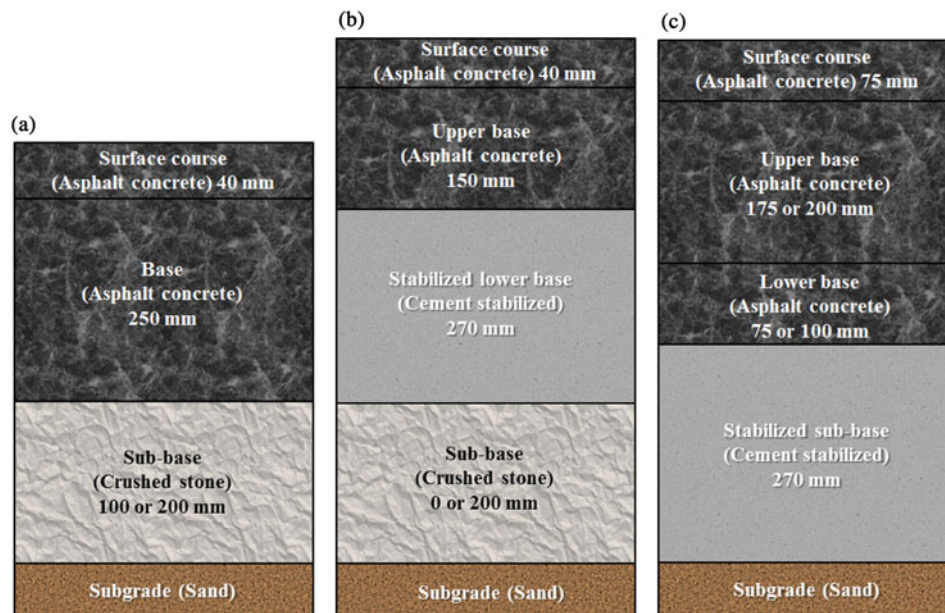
Typical cross sections for asphalt pavement designs: (a) AC design, (b) flexible-composite design, (c) perpetual pavement design.
